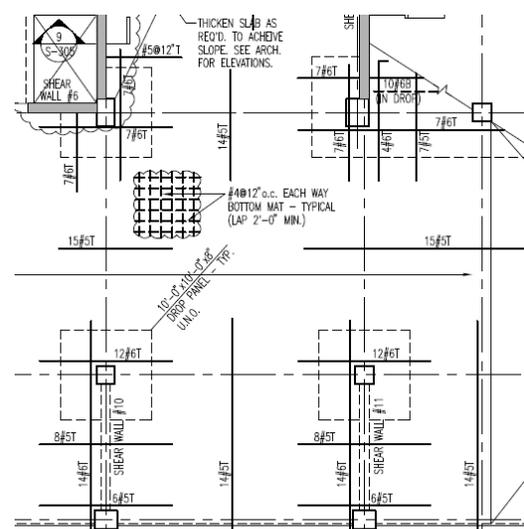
Partial Plan Level P1 (Source: Cagley & Assoc. Drawing S-201)
